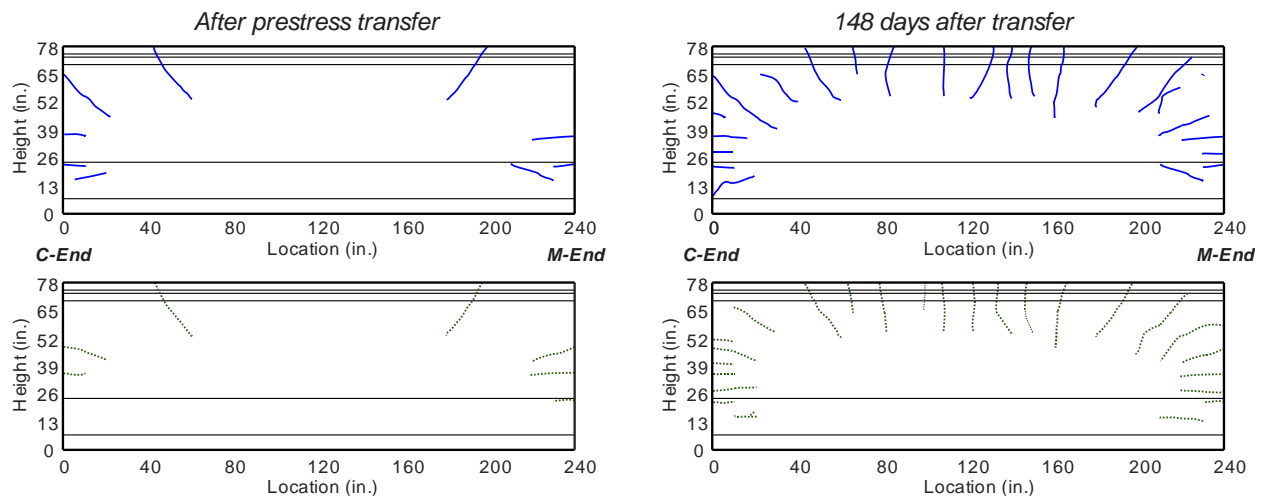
CT Crack patterns shown on North face of specimen. Solid blue lines depict cracks visible on the North face and dashed green lines depict cracks visible on the South face.
